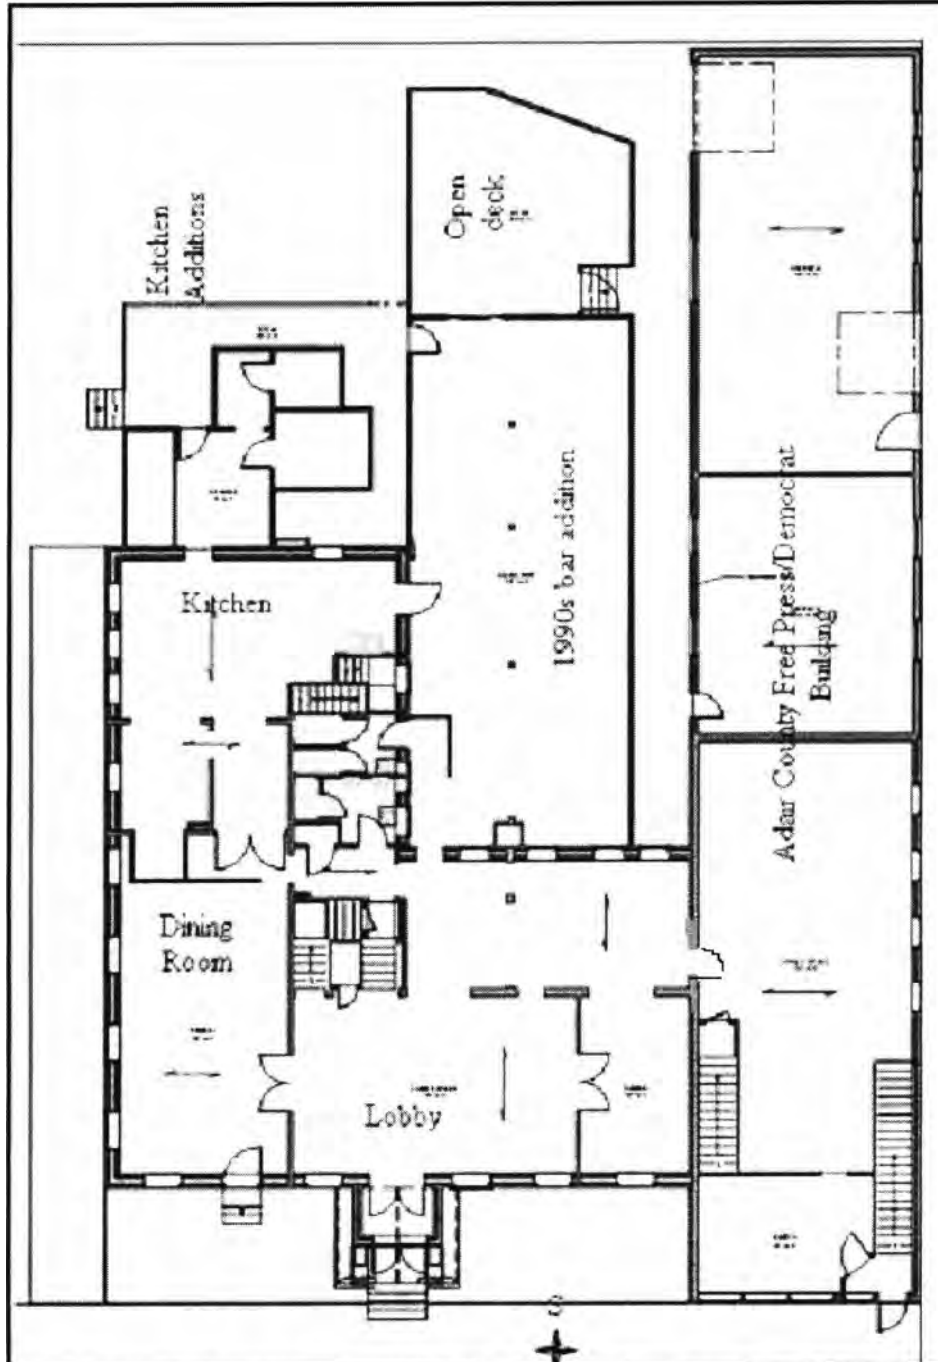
Current first floor (TBE Architects & Design, Inc., 2011)
